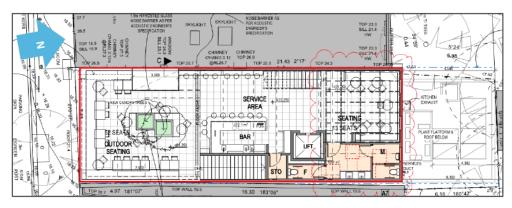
Proposed Second Floor Plan (Image Source: YBL Remmus Architecture)
